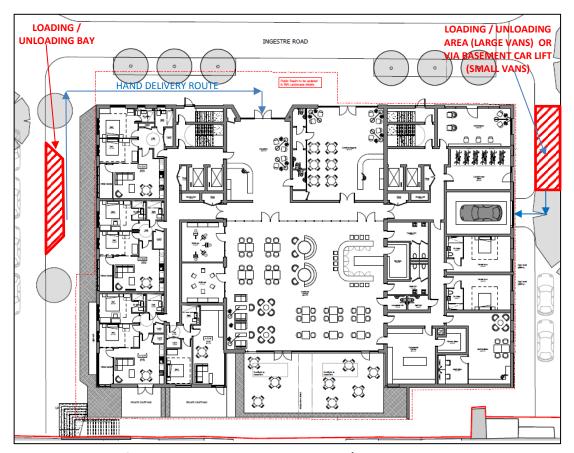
Ground floor plan showing the delivery area / unloading bay
